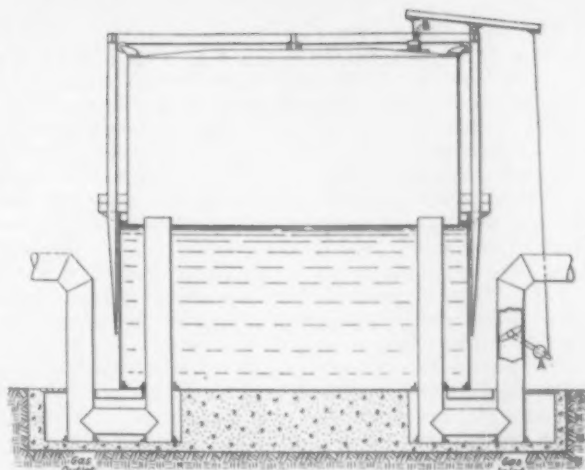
Arrangement of Regulating Valve for Gas Holder
